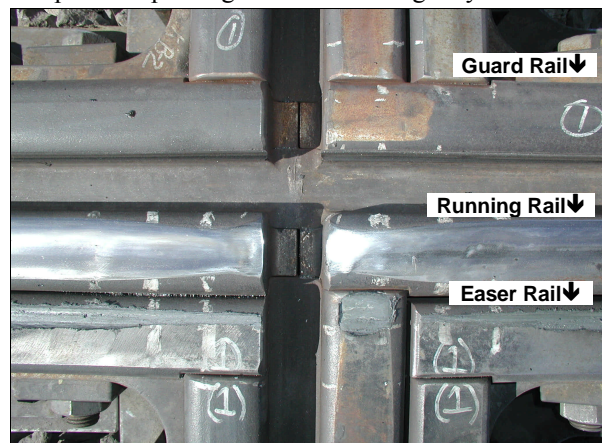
Plan View of Herringbone Corner as Tested at FAST
